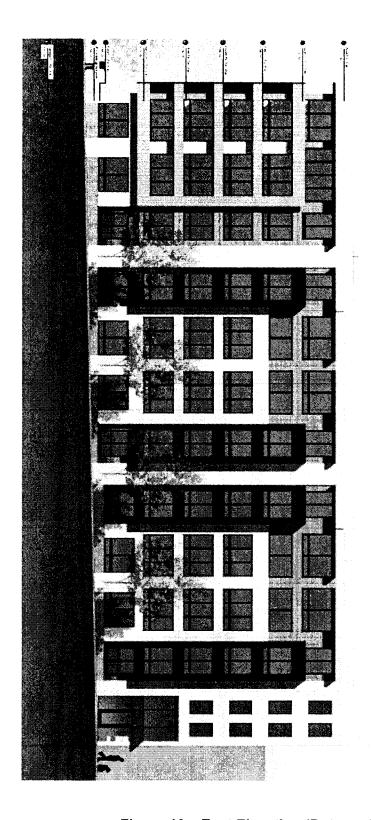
East Elevation (Potrero Avenue) 480 Potrero Avenue Source: Sia Consulting, August 2012
